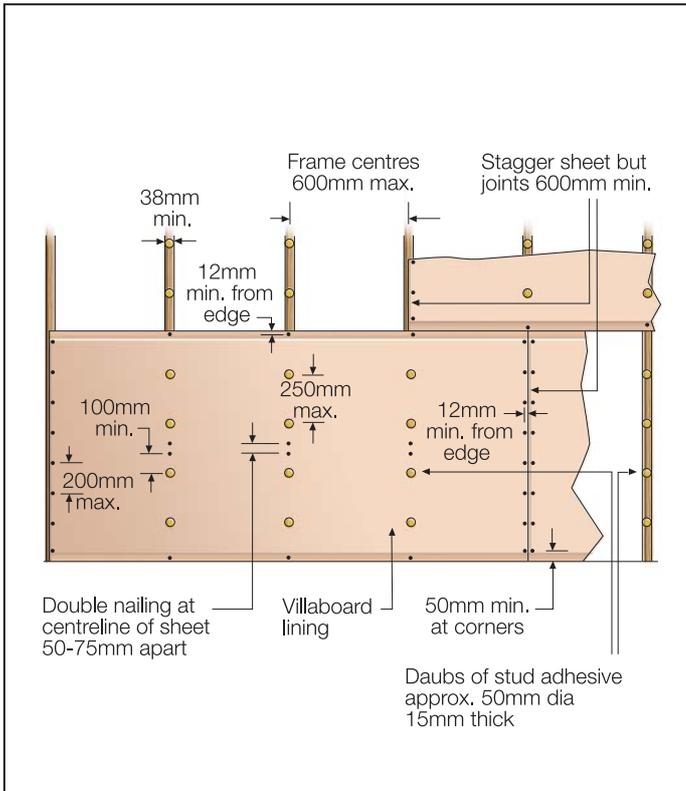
FASTENER / ADHESIVE FIXING TO CEILING FRAMES
